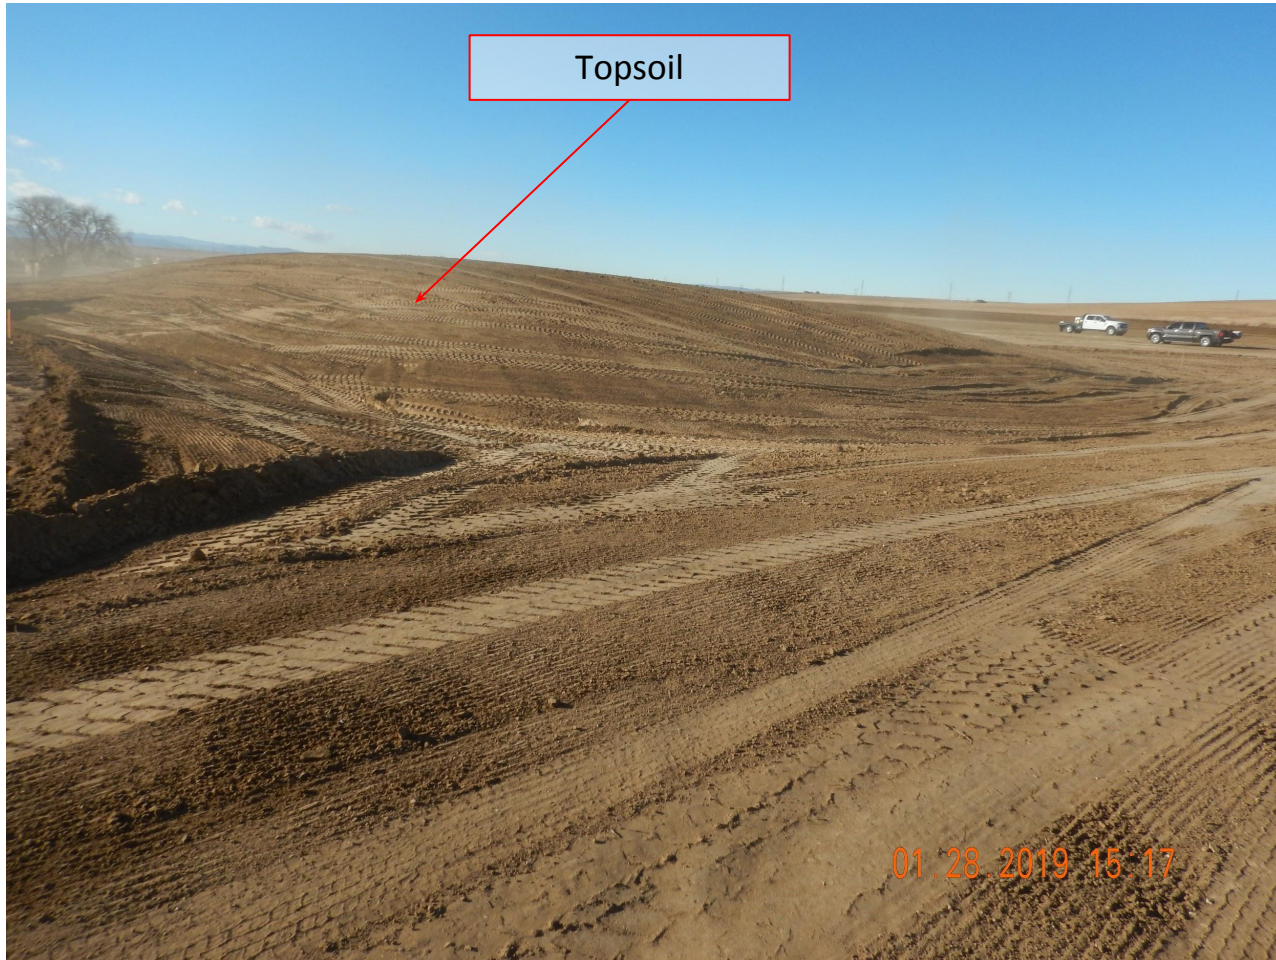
Photo taken from the southeastern perimeter of the location, facing West. Photo illustrates the topsoil stockpile and fugitive dust.
